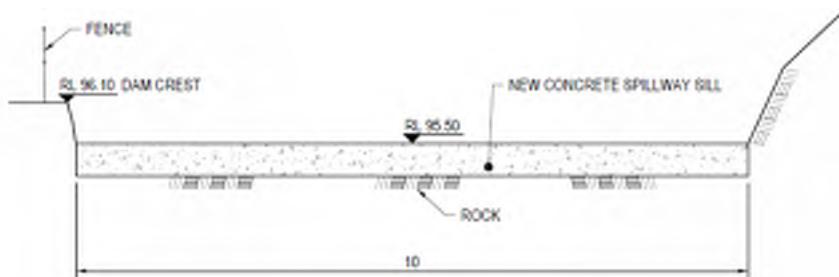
Cross section of concrete spillway crest – Option 1D
